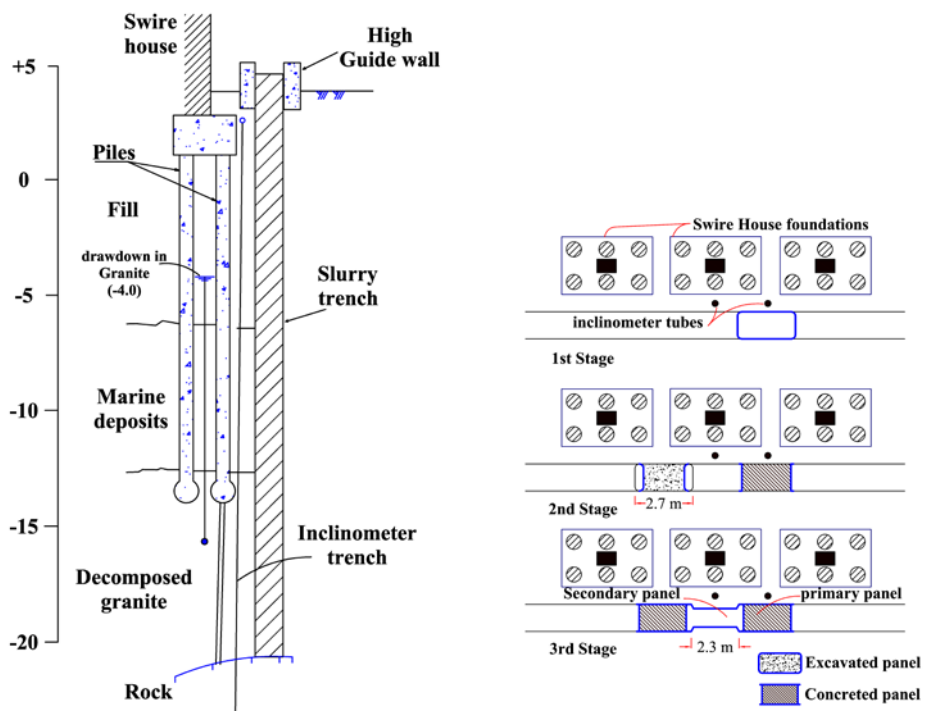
Diaphragm wall near Swire House (after Davies and Henkel, 1982)
